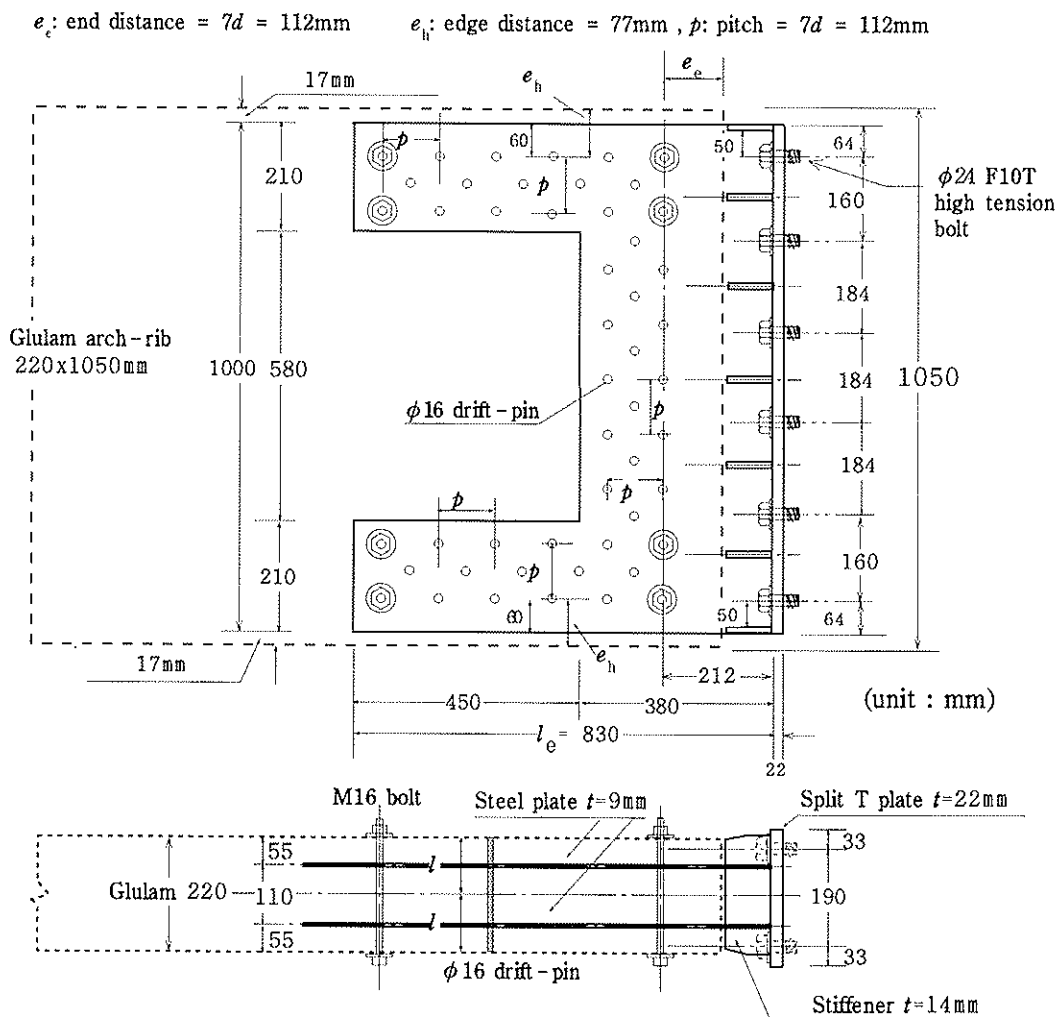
Details of moment-resisting joint using Π -shaped insert steel plates with $\phi 16$ mm drift-pins (including 8-M16 bolts for using on-site connection).
